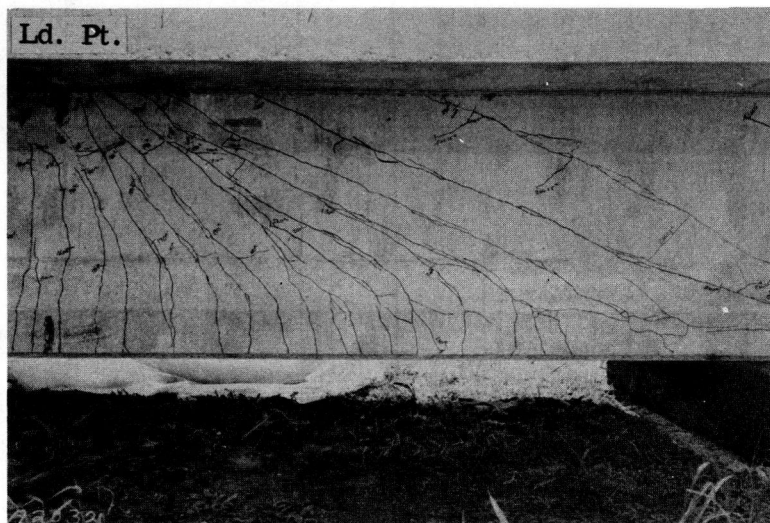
Cracking pattern, composite shear test, pretensioned beam.
